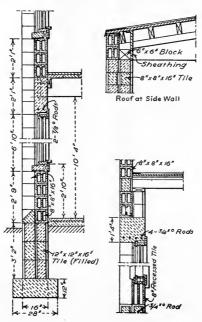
Hollow concrete tile walls. Hunter Illuminated Car Sign Co., Flushing, Long Island.
